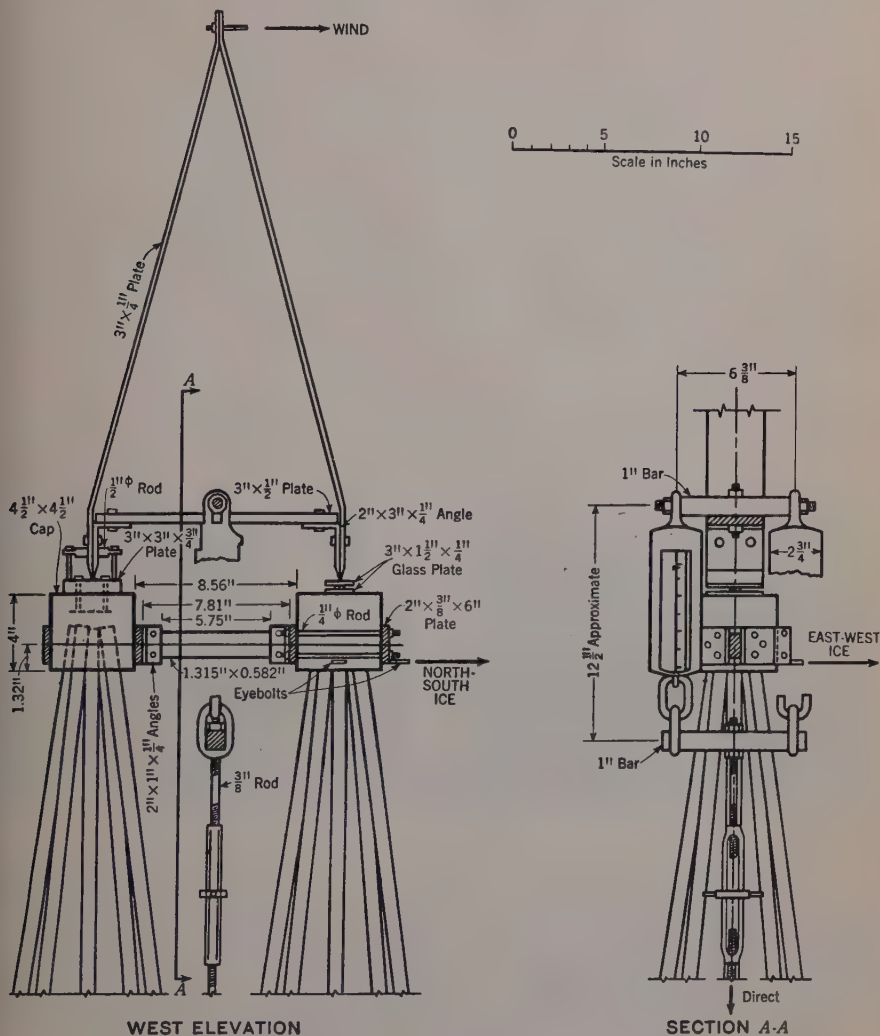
PIER CAP AND ASSOCIATED APPARATUS
